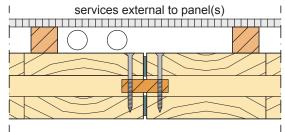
Wall connection with jointing piece, Source: Binderholz
